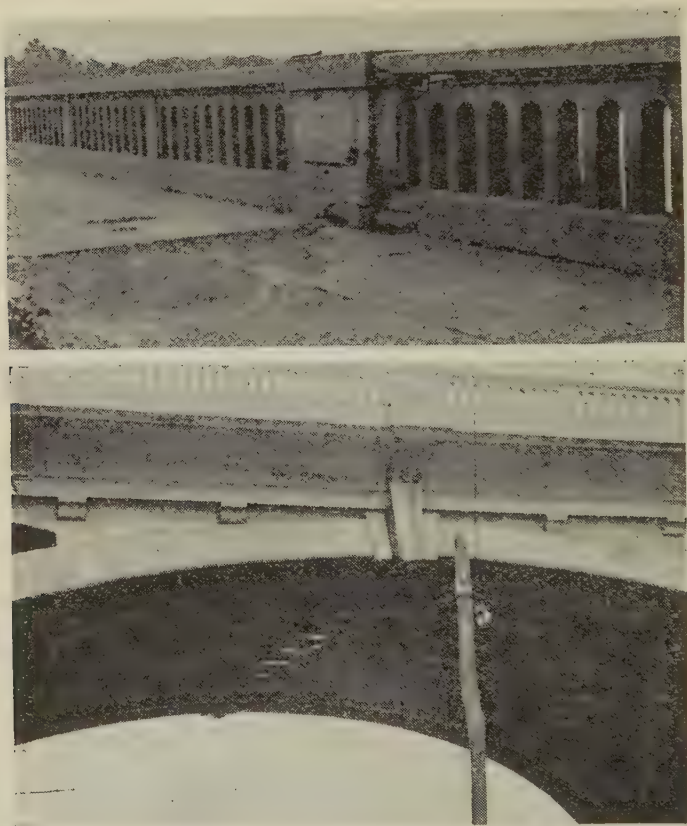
THE OPENING PROVIDED IN THE DECK AND RAILING WAS LESS THAN BETWEEN THE ENDS OF THE CANTILEVER GIRDERS AND THIS DAMAGE RESULTED
